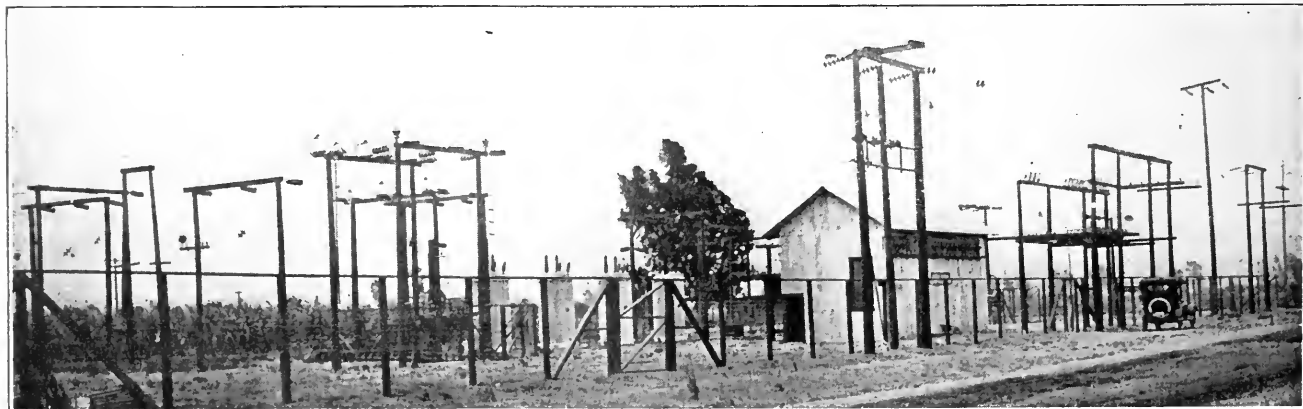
GENERAL VIEW OF MADERA (CAL.) OUTDOOR SUBSTATION
